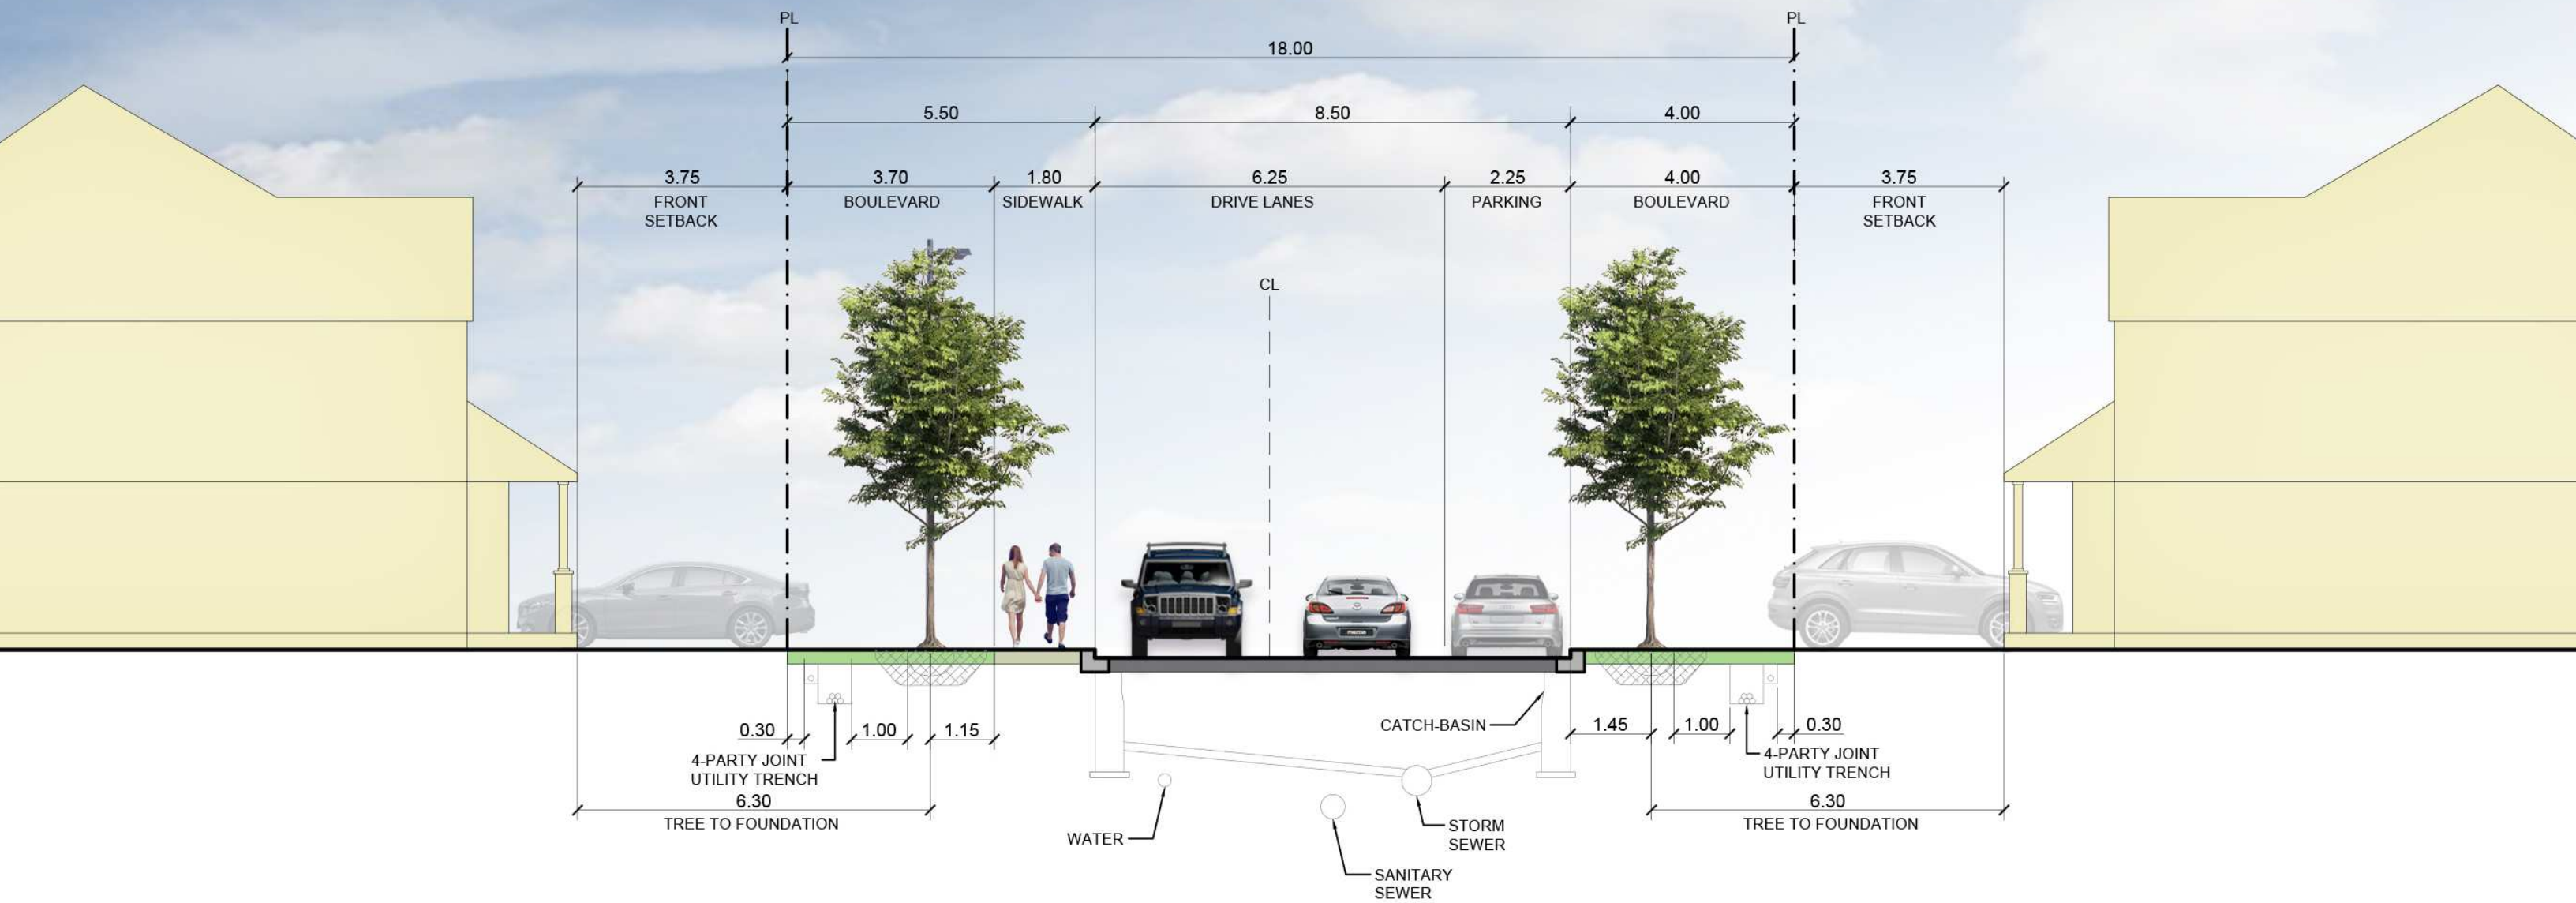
Local Road (Typical 18.0m Right-of-Way) Cross Section
